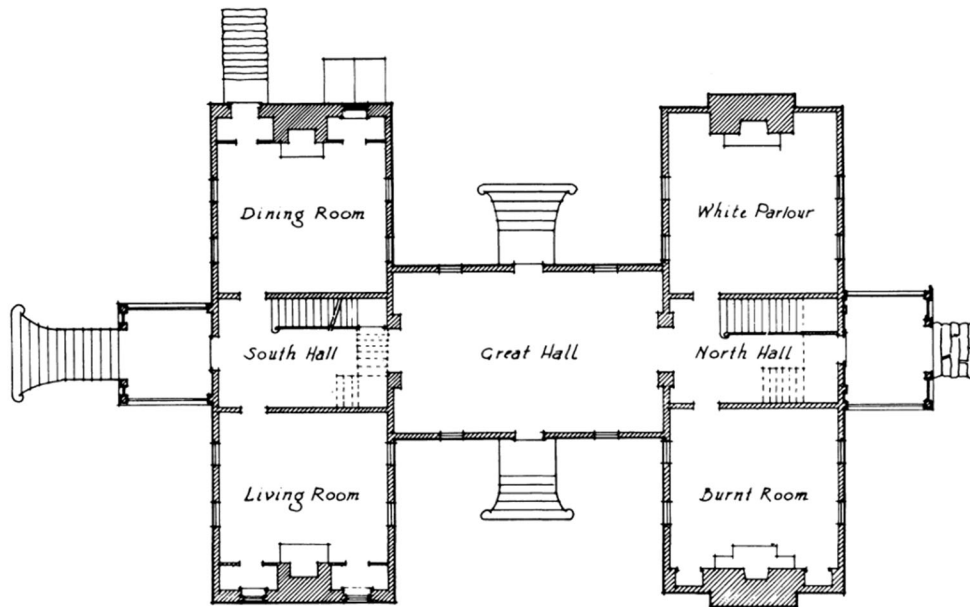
First-floor plan, Tuckahoe, Goochland Co., Va. (Drawing, Howard L. Rich.)
